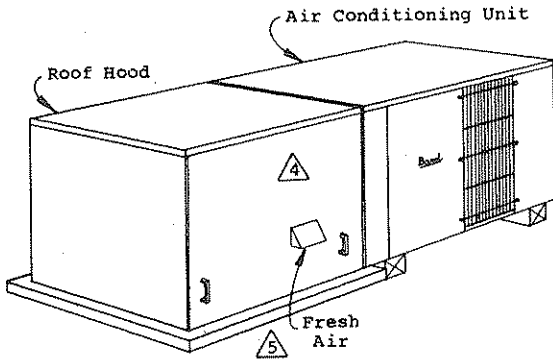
TYPICAL ROOFTOP INSTALLATION
